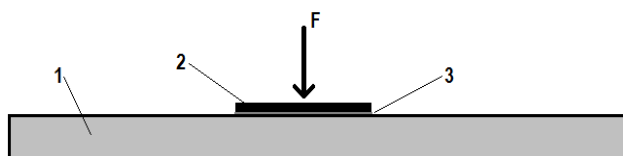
Diagram of loading test on polymer concrete panel: 1 – polymer concrete panel, 2 – rigid steel slab distributing load on suitable surface, 3 – rubber pad
